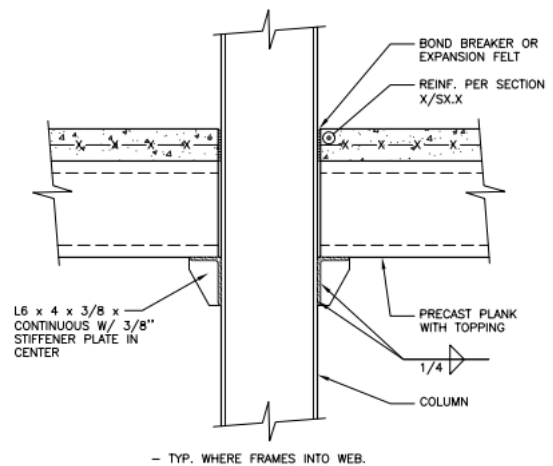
Precast Plank Support at Steel Column (S12.20 Drawing 8)
